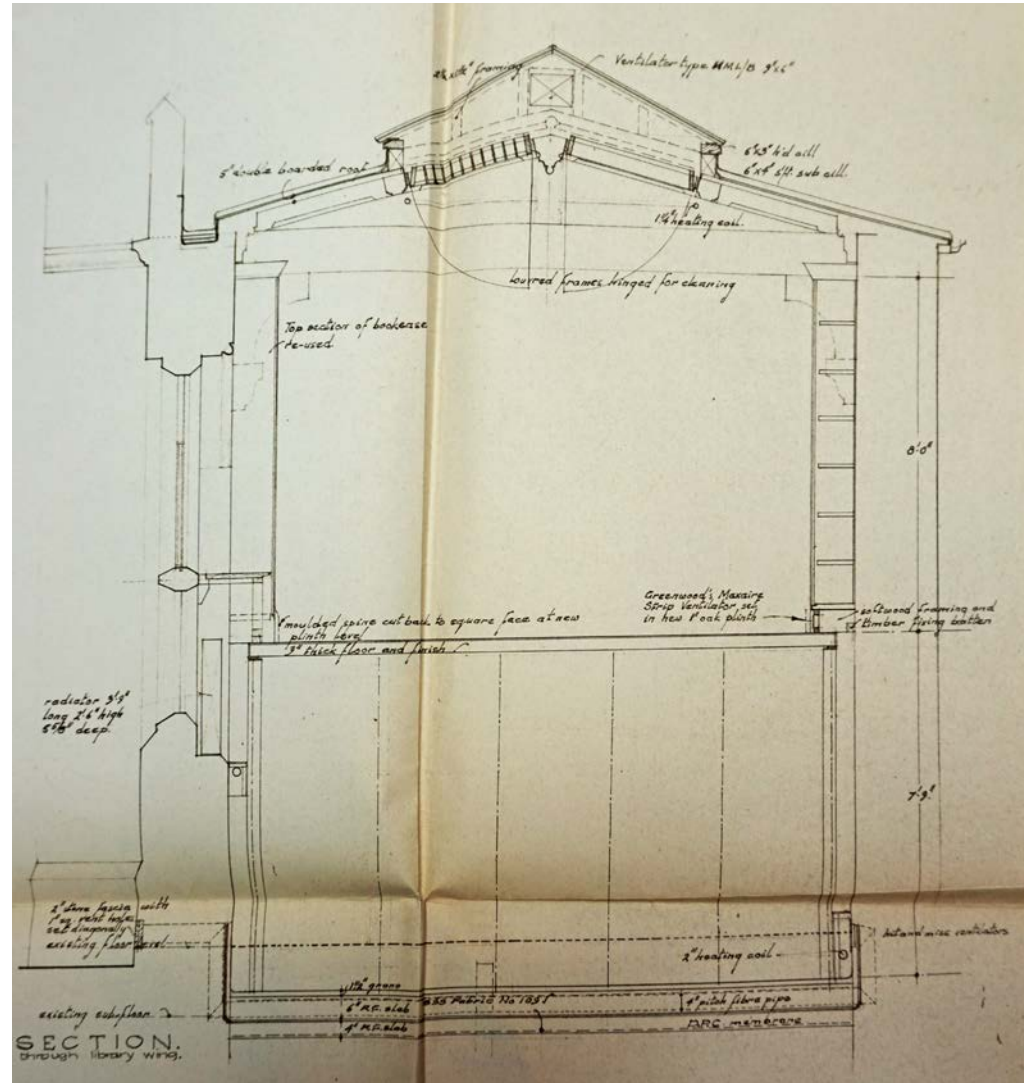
1957 section through the Annex showing the insertion of the mezzanine and rooflights between the original roof structure, Fielding, Dodd and Stevens (Exeter College Archive)
